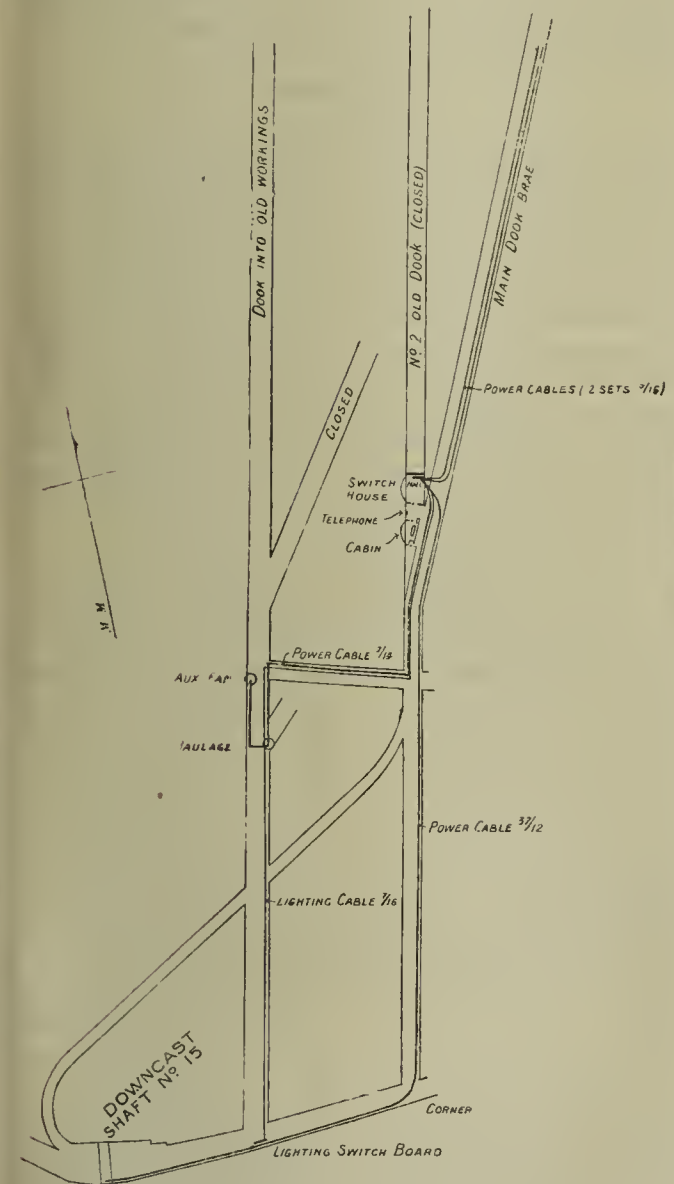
PLAN SHOWING POSITIONS OF CABLES, SWITCH PANEL, ETC., IN PIT BOTTOM.
